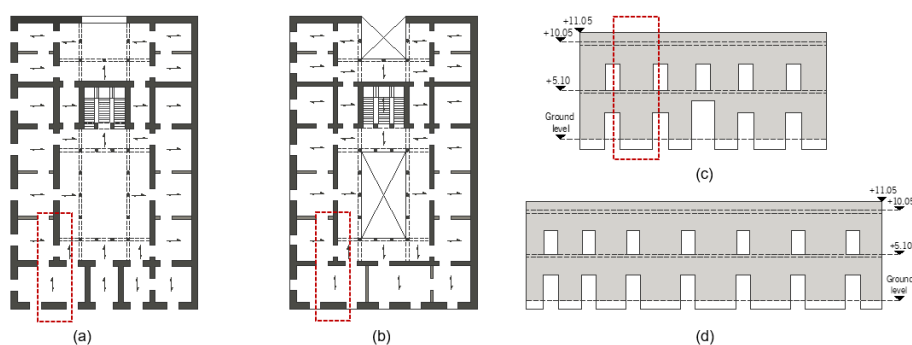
Typical viceregal building in Mexico: (a) ground floor (b) upper floor, (c) main façade, and (d) lateral façade.
